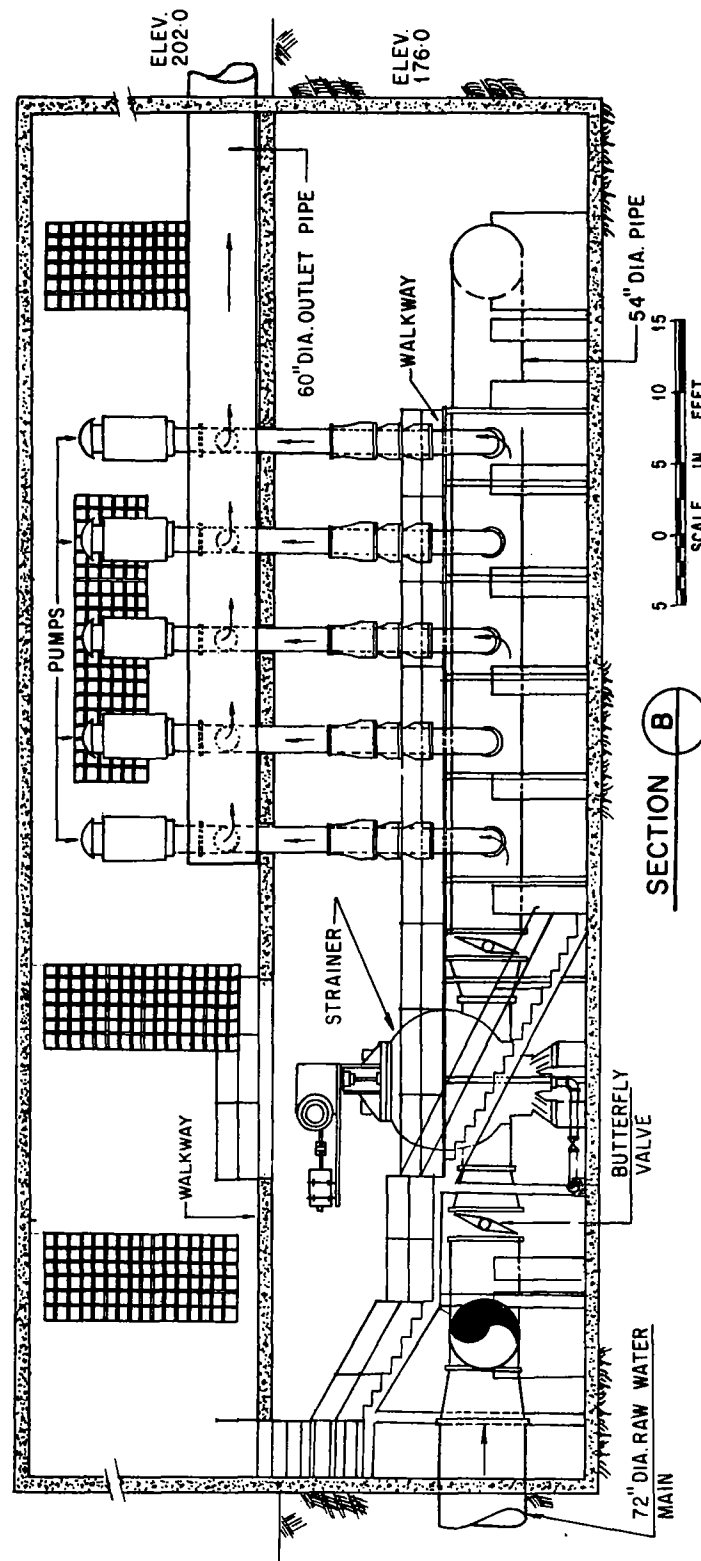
SECTION OROPOUCHE RAW WATER PUMP STATION
